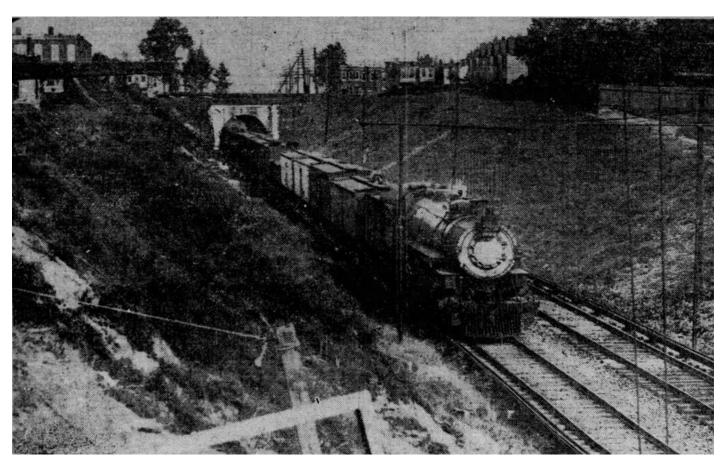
Eastbound train exiting the east portal of the Guilford Avenue Bridge, looking northwest, in 1912 prior to the construction of the East 26th Street retaining wall. Image Credit: *The Sun*, September 28, 1912
